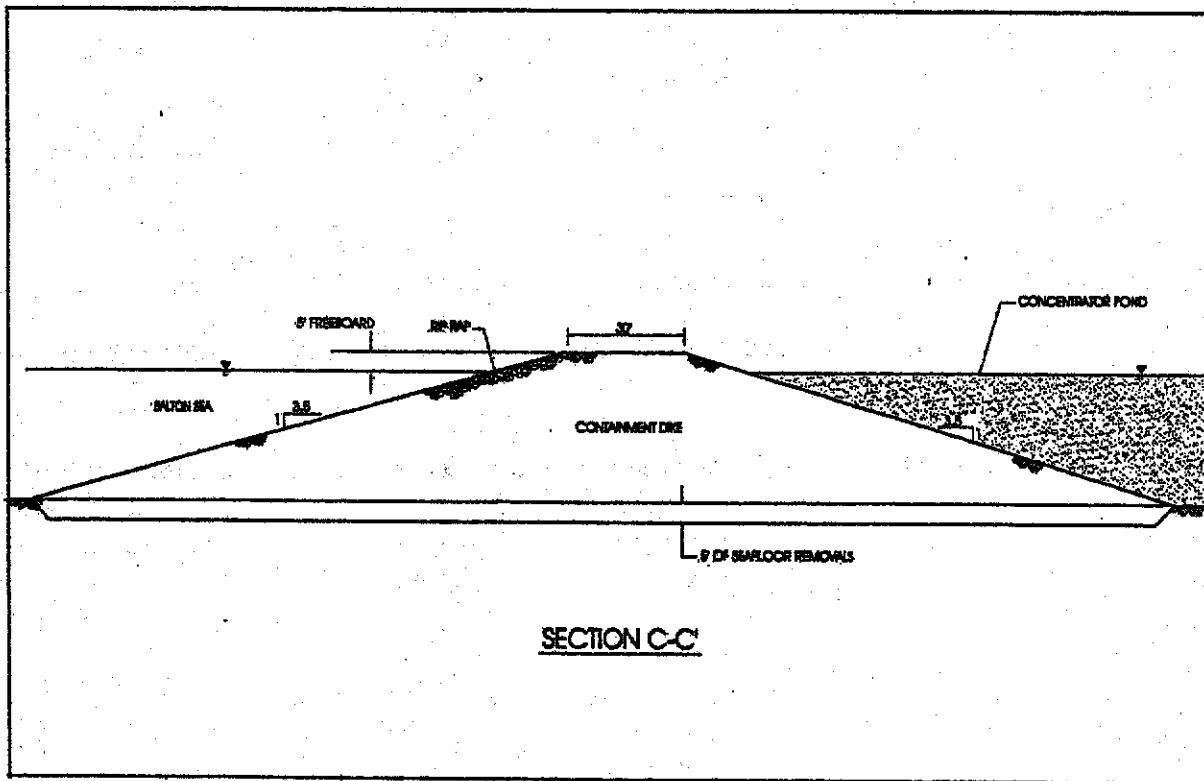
Typical Embankment for In-Sea Containment Dike
